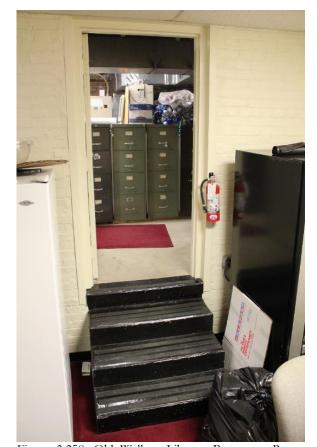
, Old Wallace Library, Basement, Room 004, view of short flight of wood stairs and door leading to Room 001.
